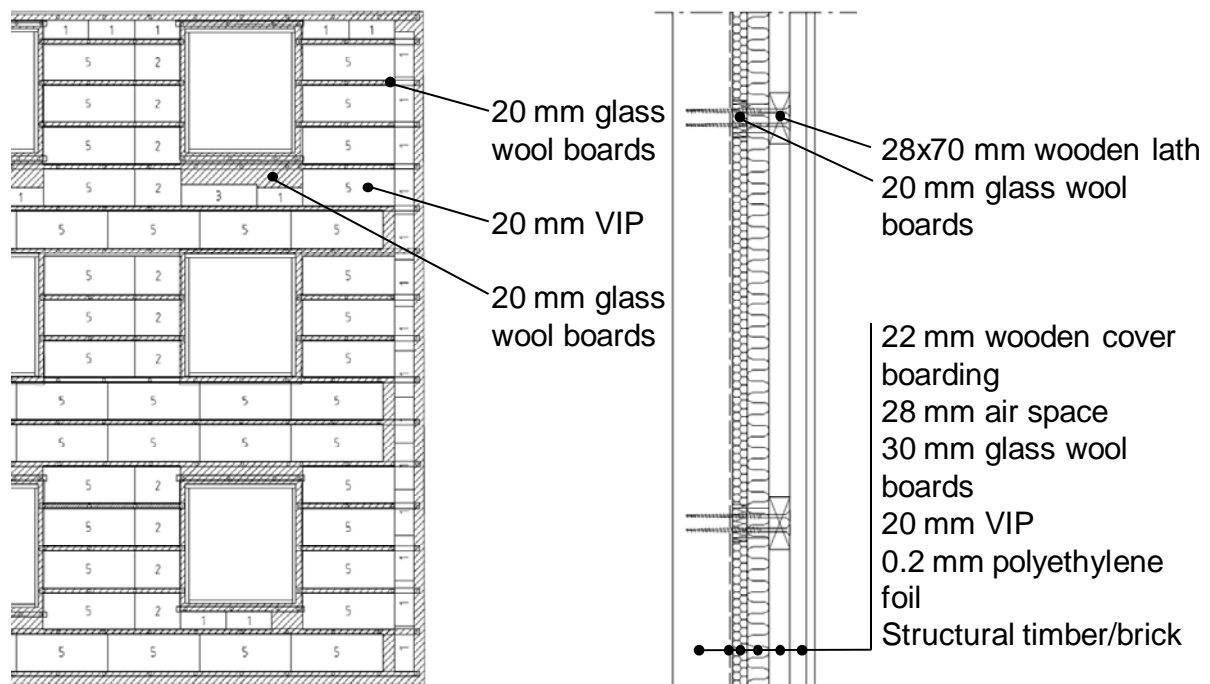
Wall layout after retrofitting with 20 mm VIP and 30 mm glass wool boards.
